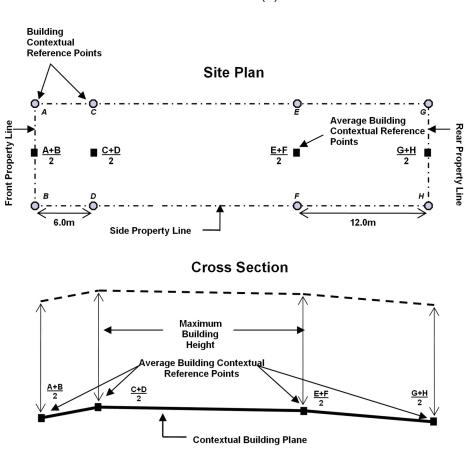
Building Height in the Developed Area Subsection 362(1)
